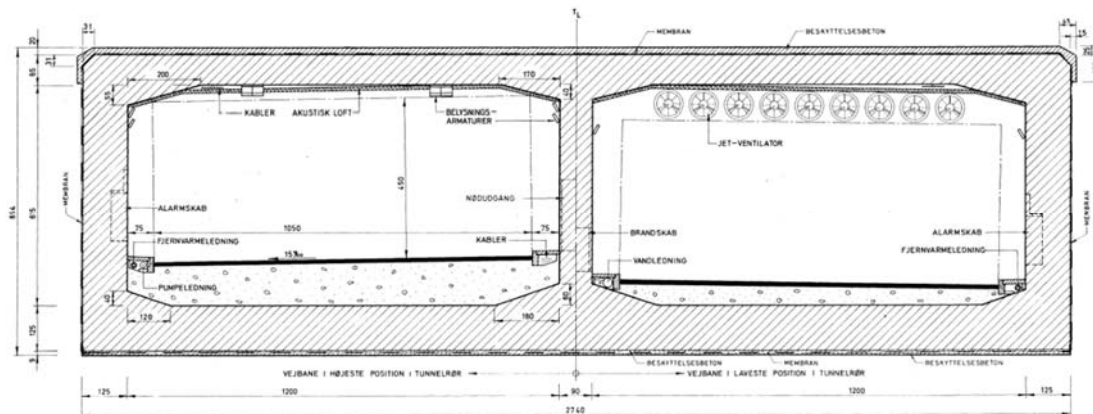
Typical cross section of tunnel under the fjord.
